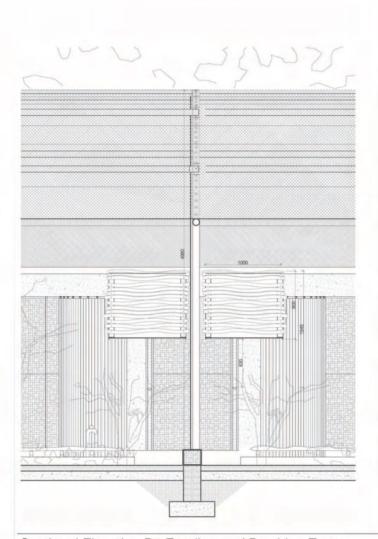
Protected Habitat Structure and Service Passage roof connection Scale 1:20
